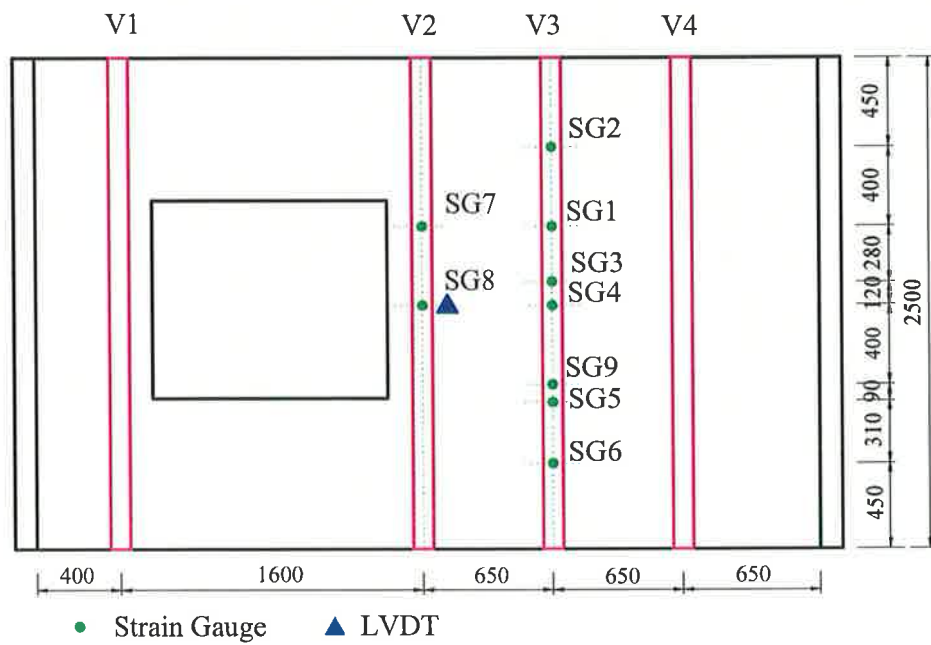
(a) Test scheme and instrumentation layout of Wall 1
